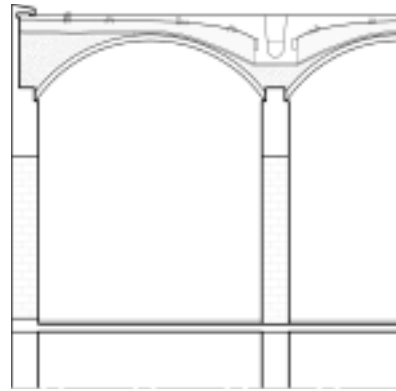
Section through the roof garden showing construction with scupper beyond.
